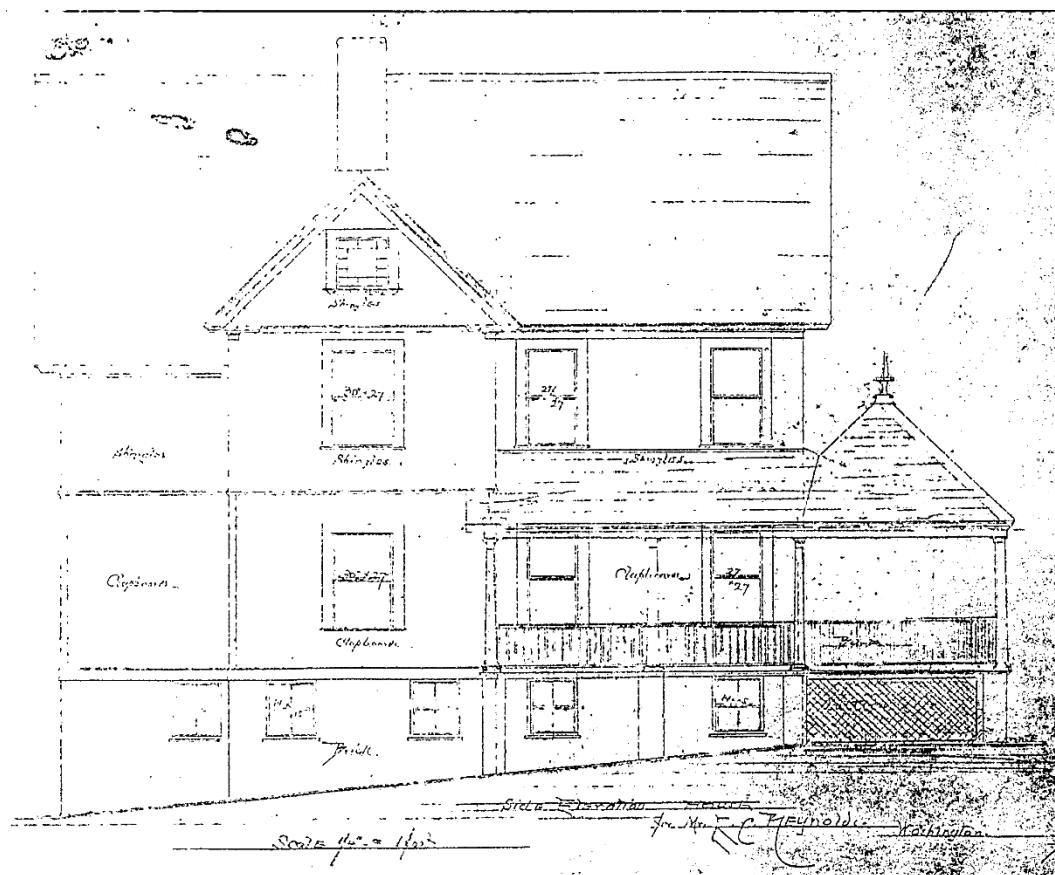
West (side) elevation of the Edwin and Julia Reynolds House.
